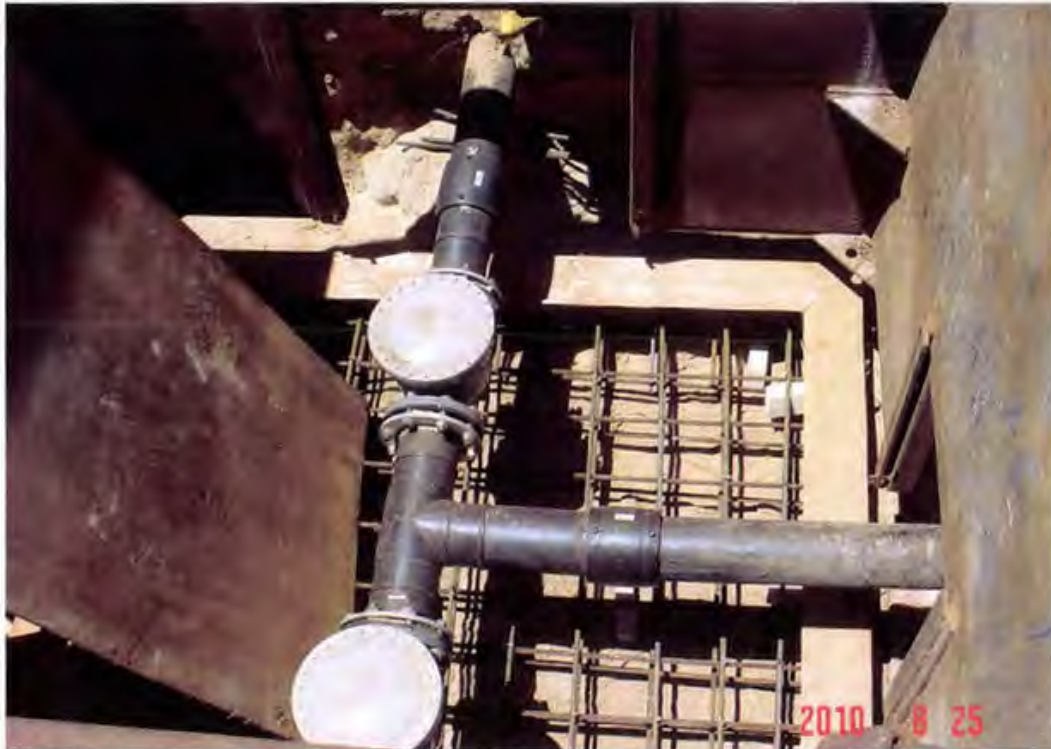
Floor of the new concrete valve box form work prior to concrete pour. Check valves on the forcemain direct flow through the tee and out to the NLEP
